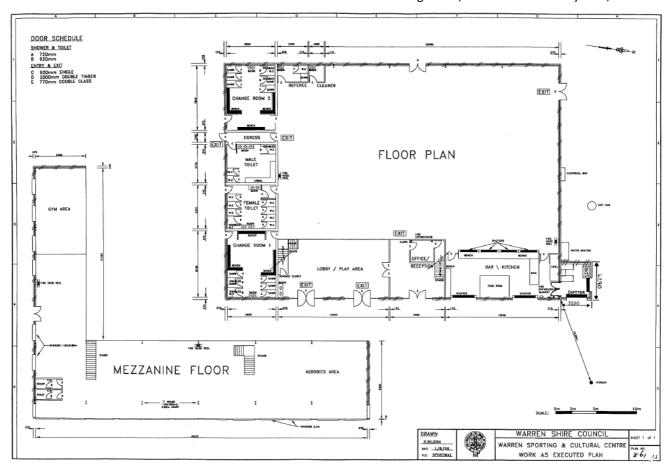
Warren Sporting & Cultural Centre Floor Plan (1998).
